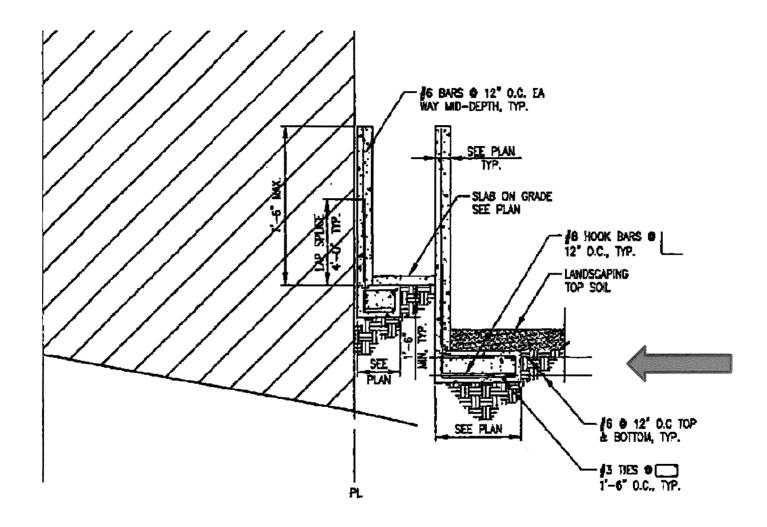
Detail 3 on Sheet S4.1 of Building Permit Application No. 201705116316
